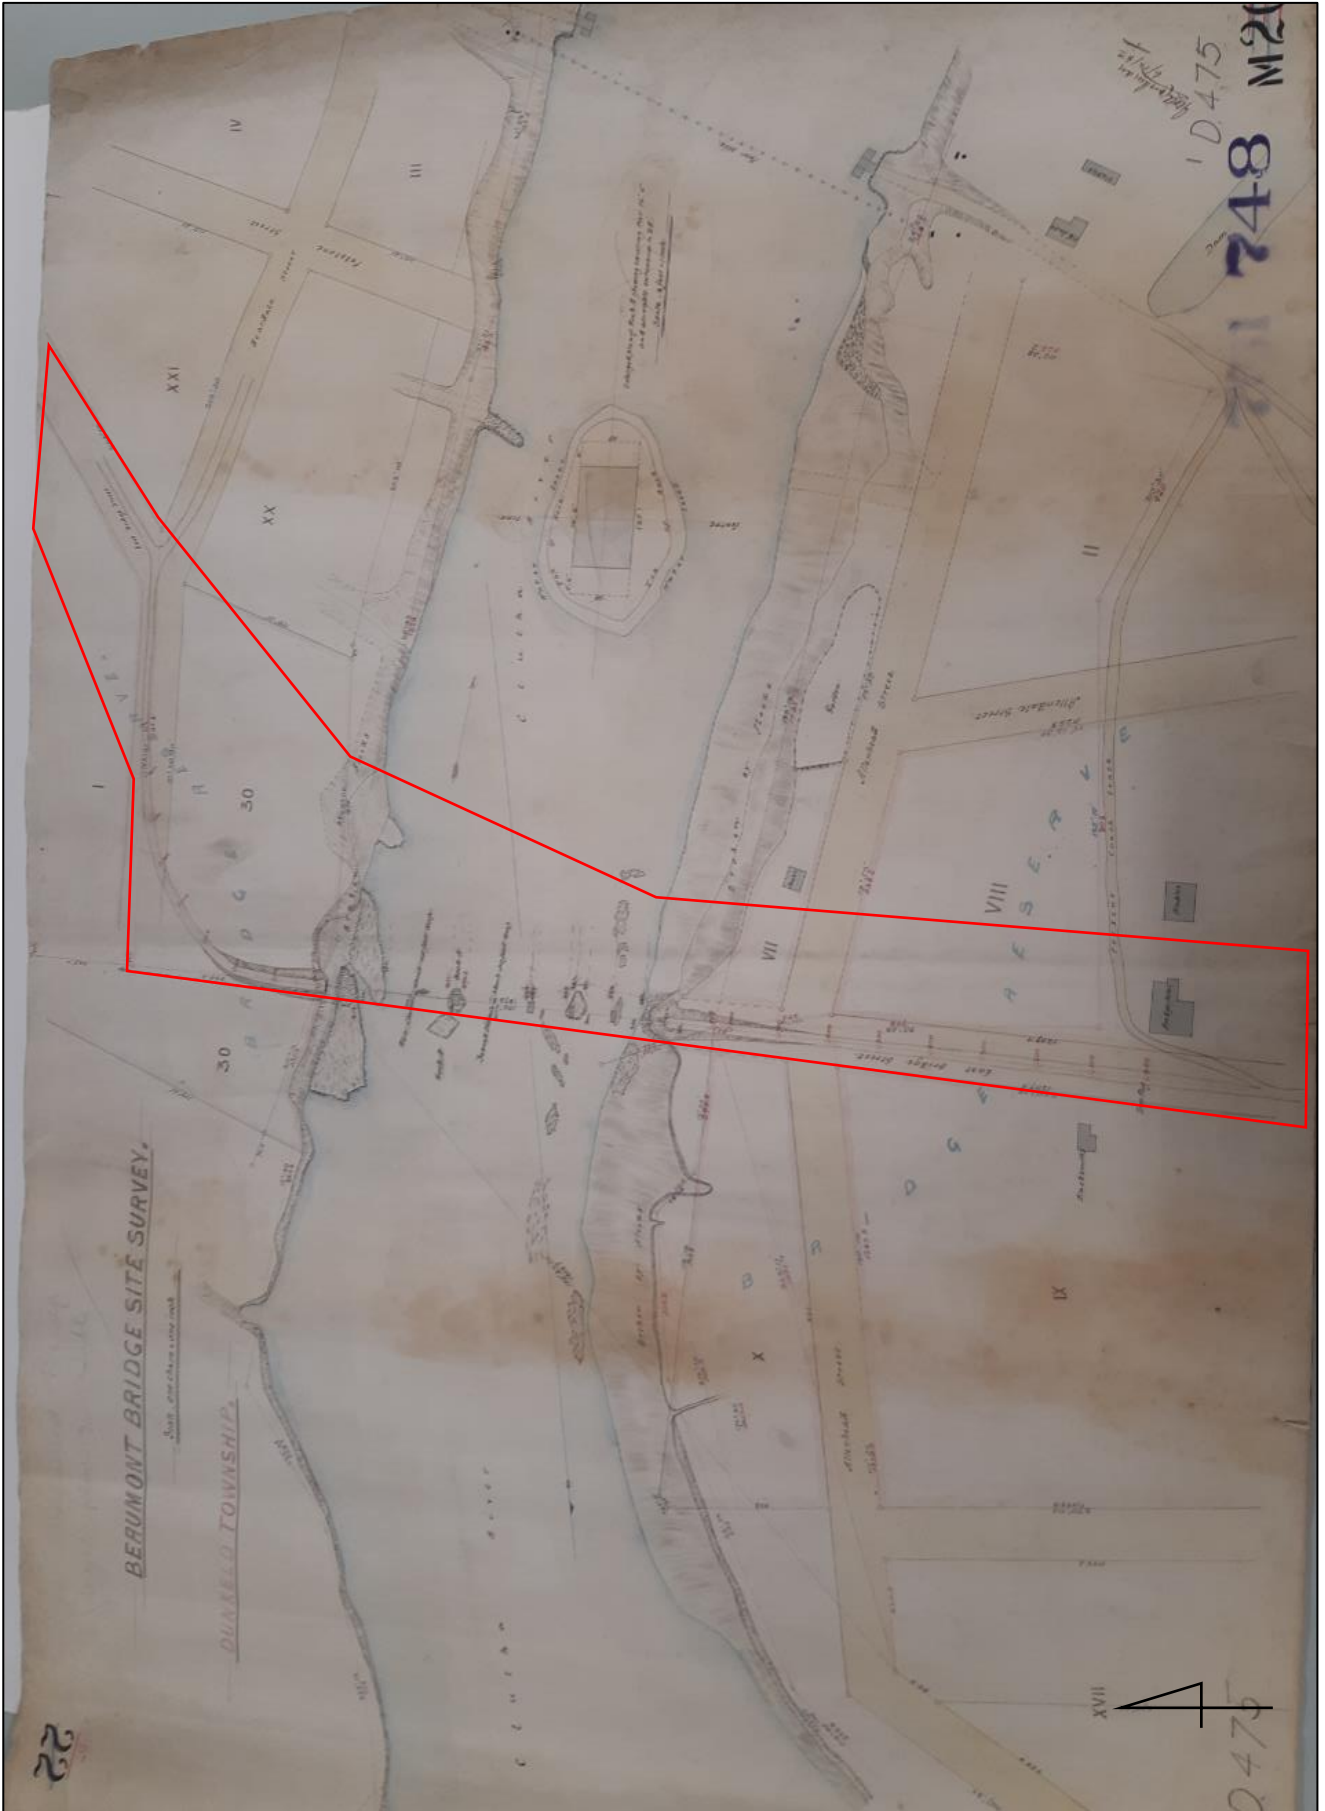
Beaumont Bridge Site Survey 1882, orientated east (project area in red; source: Archives New Zealand)
